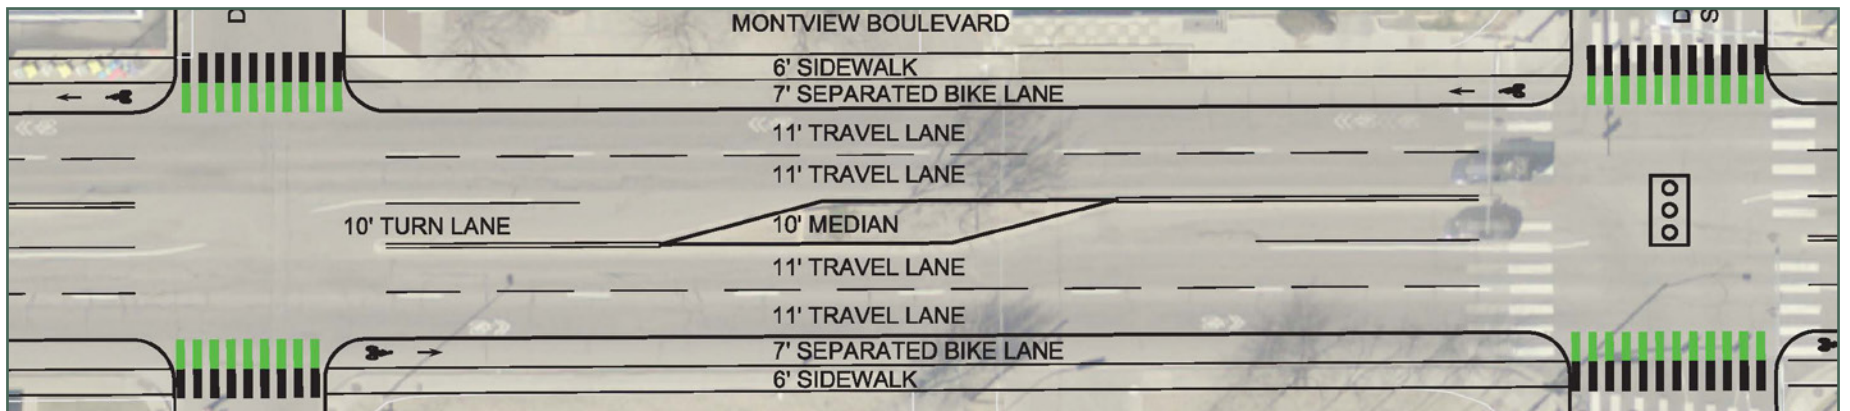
Commercial Zone Enhanced Existing with Separated Bikeway - Plan
